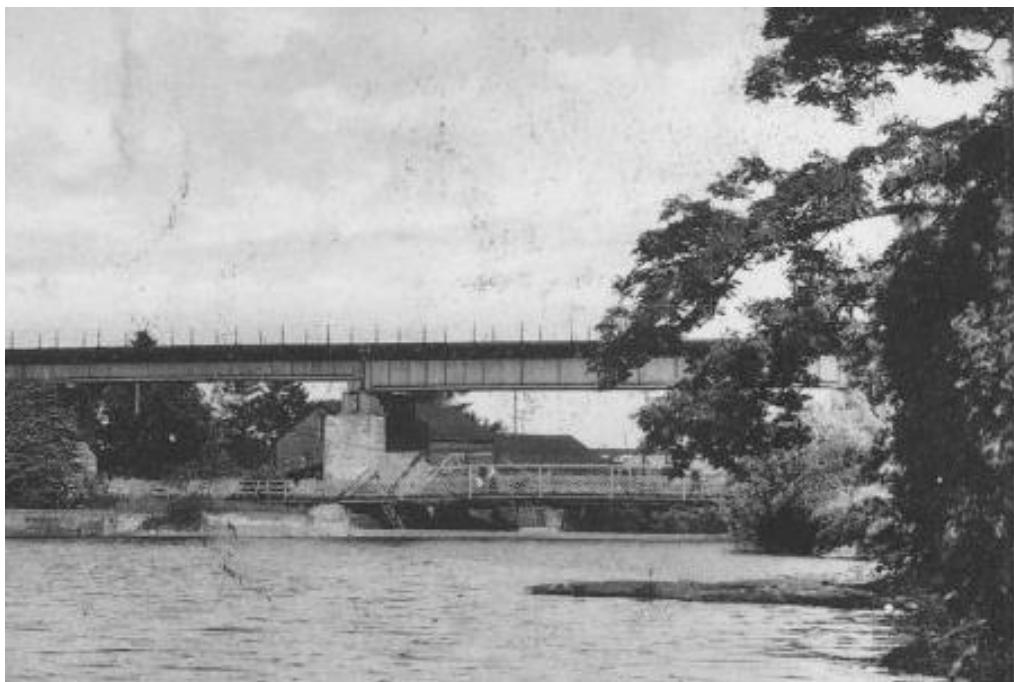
Pedestrian bridge adjacent to west side of Allan's Bridge, 1909
